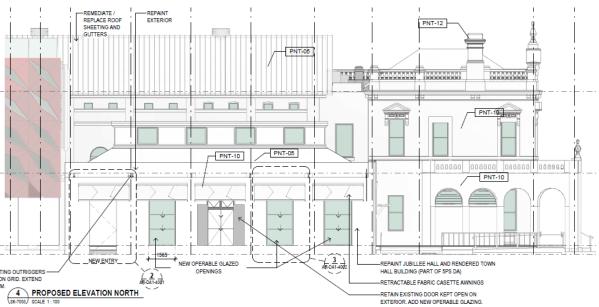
Northern elevation proposed (Source: Architectural Drawing No. AR-DA1-2001, Rev C)
